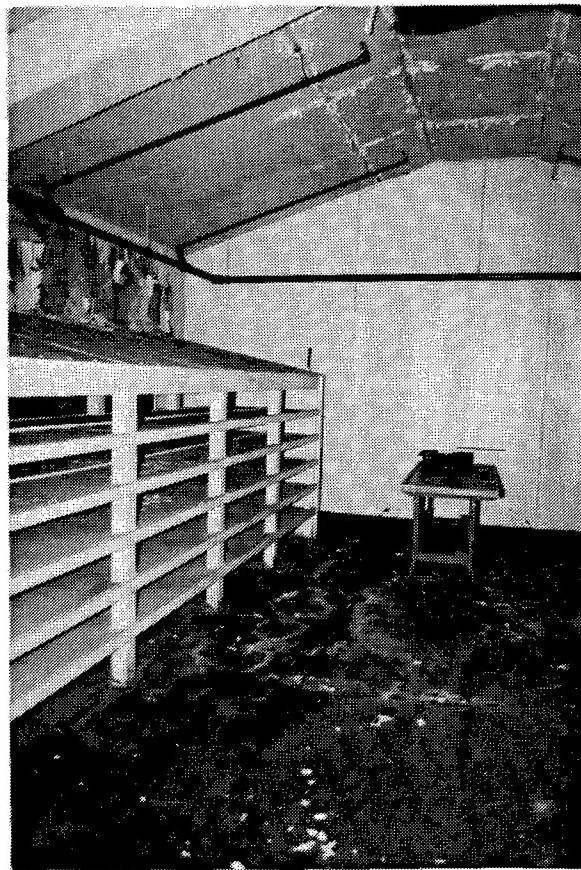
Building PE-4: Interior view of this Metal Parts Loading Building.
